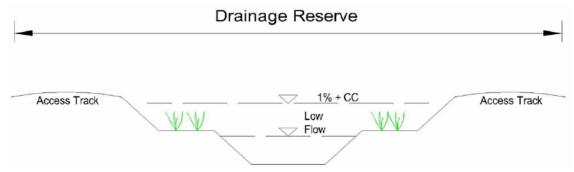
Indicative cross section for riparian/stormwater drainage corridor
